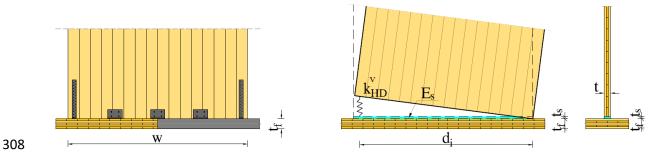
CLT wall with rigid foundation (left) and elastic intermediate layer (right).
